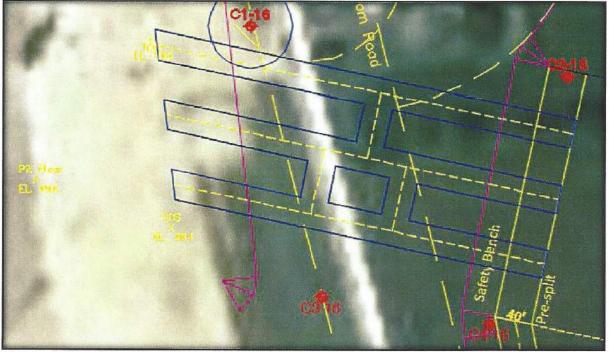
Layout of the Three Tunnels Beneath Jerome Road/County Road 11.
